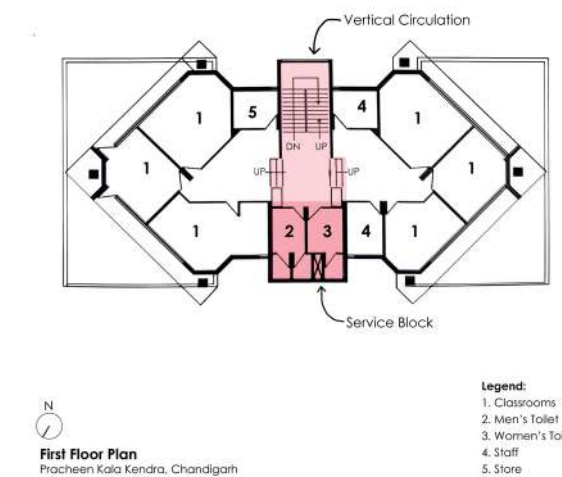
Diagram showing the service block in the First Floor Plan at Pracheen Kala Kendra
